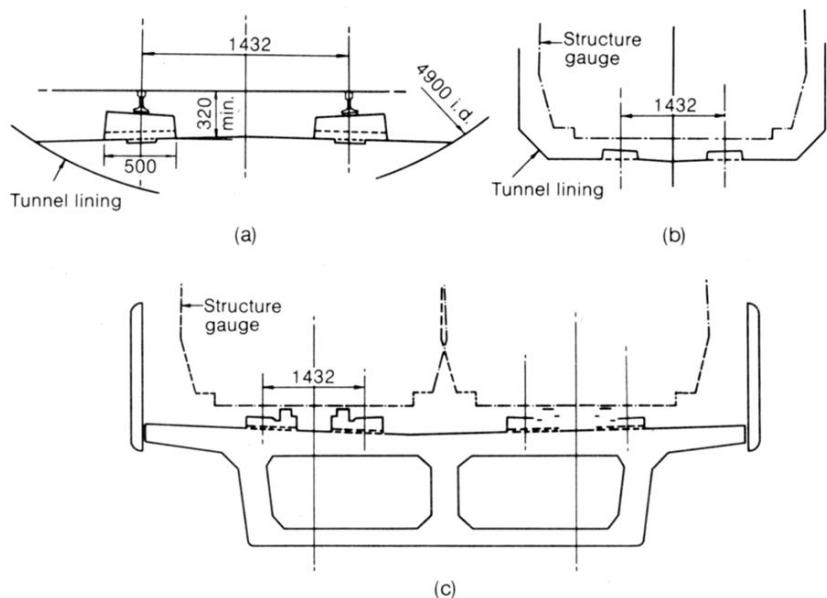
Typical straight track sections (dimensions in millimetres): (a) circular and horseshoe tunnels; (b) cut-and-cover tunnels; (c) double tracks, overhead structure
